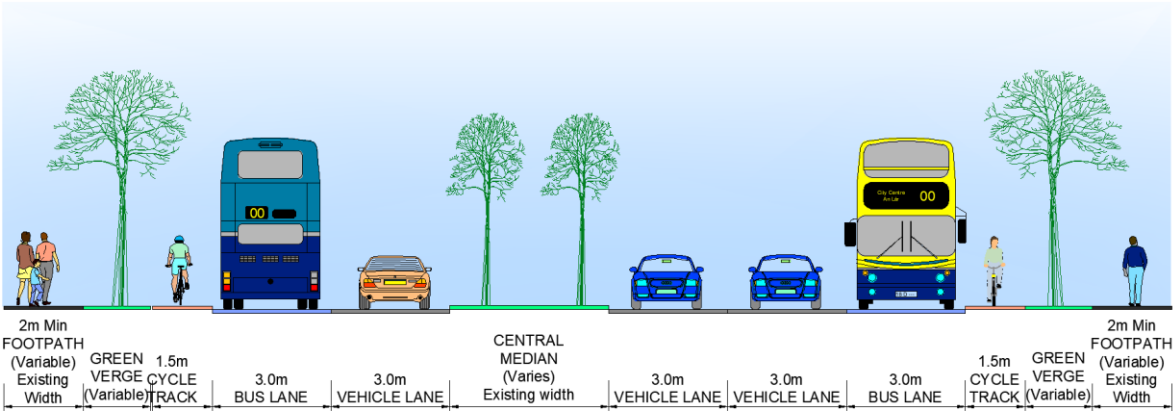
Alternative Proposed Road Cross-Section in Section 4
